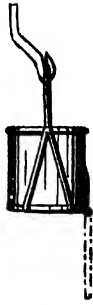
Fixed Cylindrical Receptacle or Bucket with Hinged Opening Bottom.
